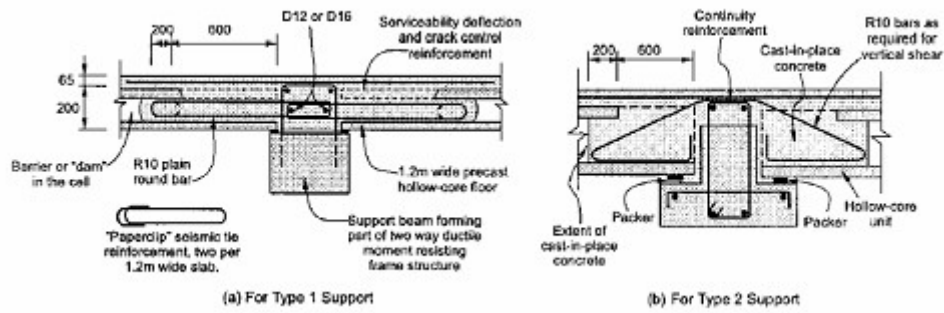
Examples of support and special support reinforcement at ends of precast concrete hollow core floors (Center for advanced engineering [16]).
